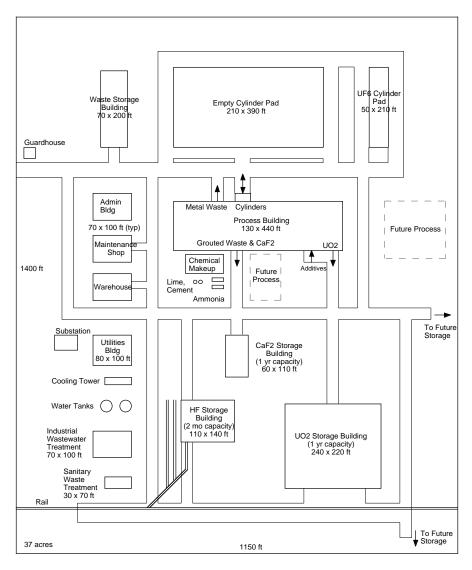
Facility Site Plan Conversion to UO2 and AHF
